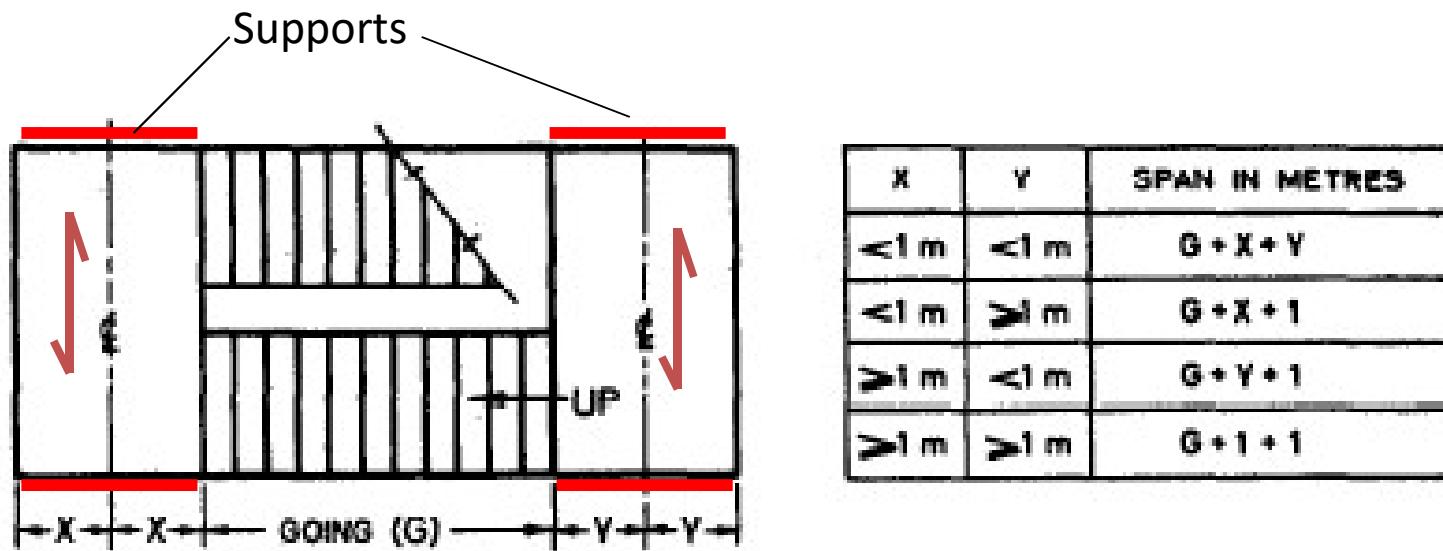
EFFECTIVE SPAN FOR STAIRS SUPPORTED AT EACH END BY LANDINGS SPANNING PARALLEL WITH THE RISERS
